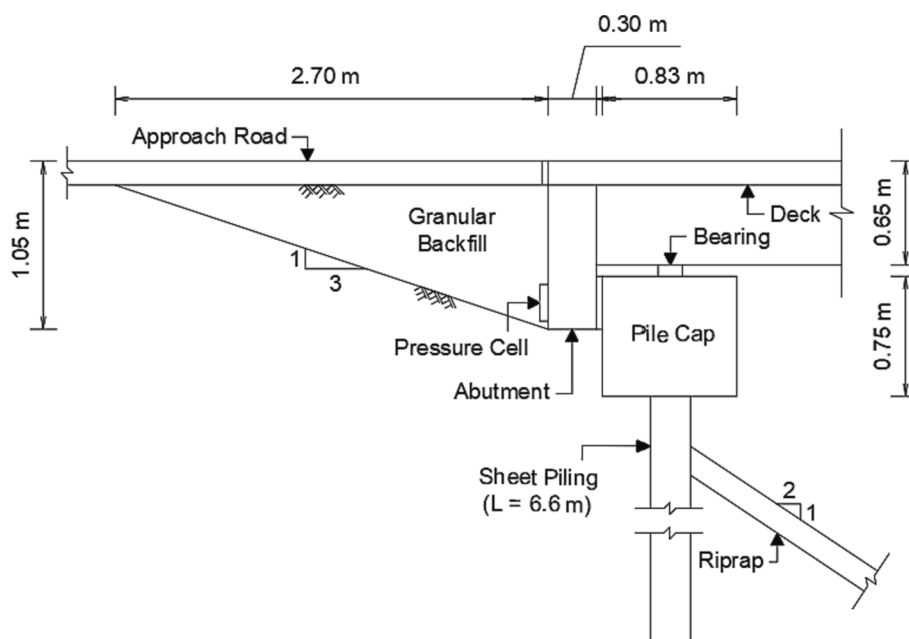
Cross-section of the semi-integral bridge system elements near the abutment.
